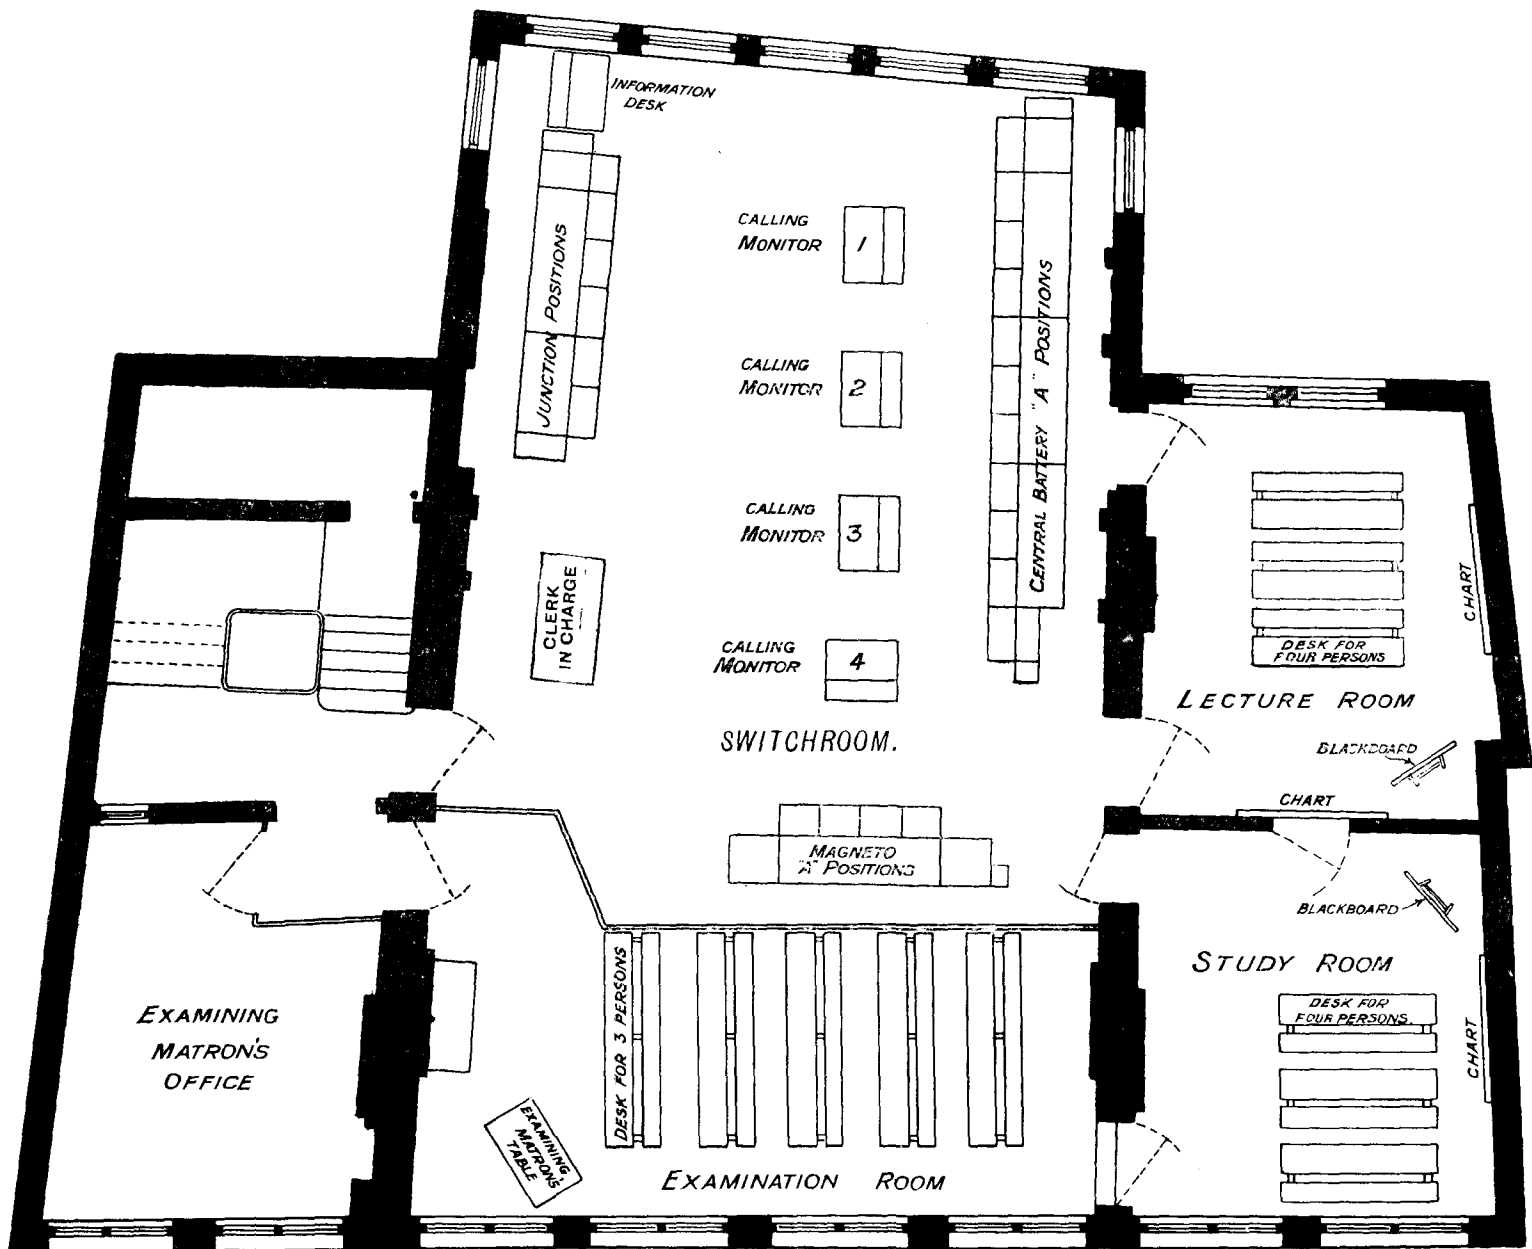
FLOOR PLAN OF THE LONDON OPERATING SCHOOLROOMS.
